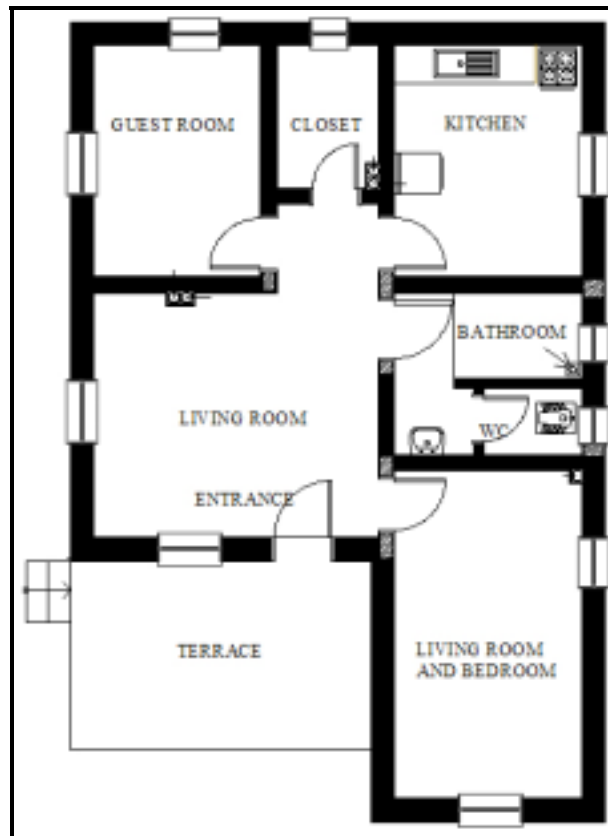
Modified Plan of the PDH with *Typical Design* in Gümerdiğin Village, Kale Quarter - Type 1 (84.81 m²)
